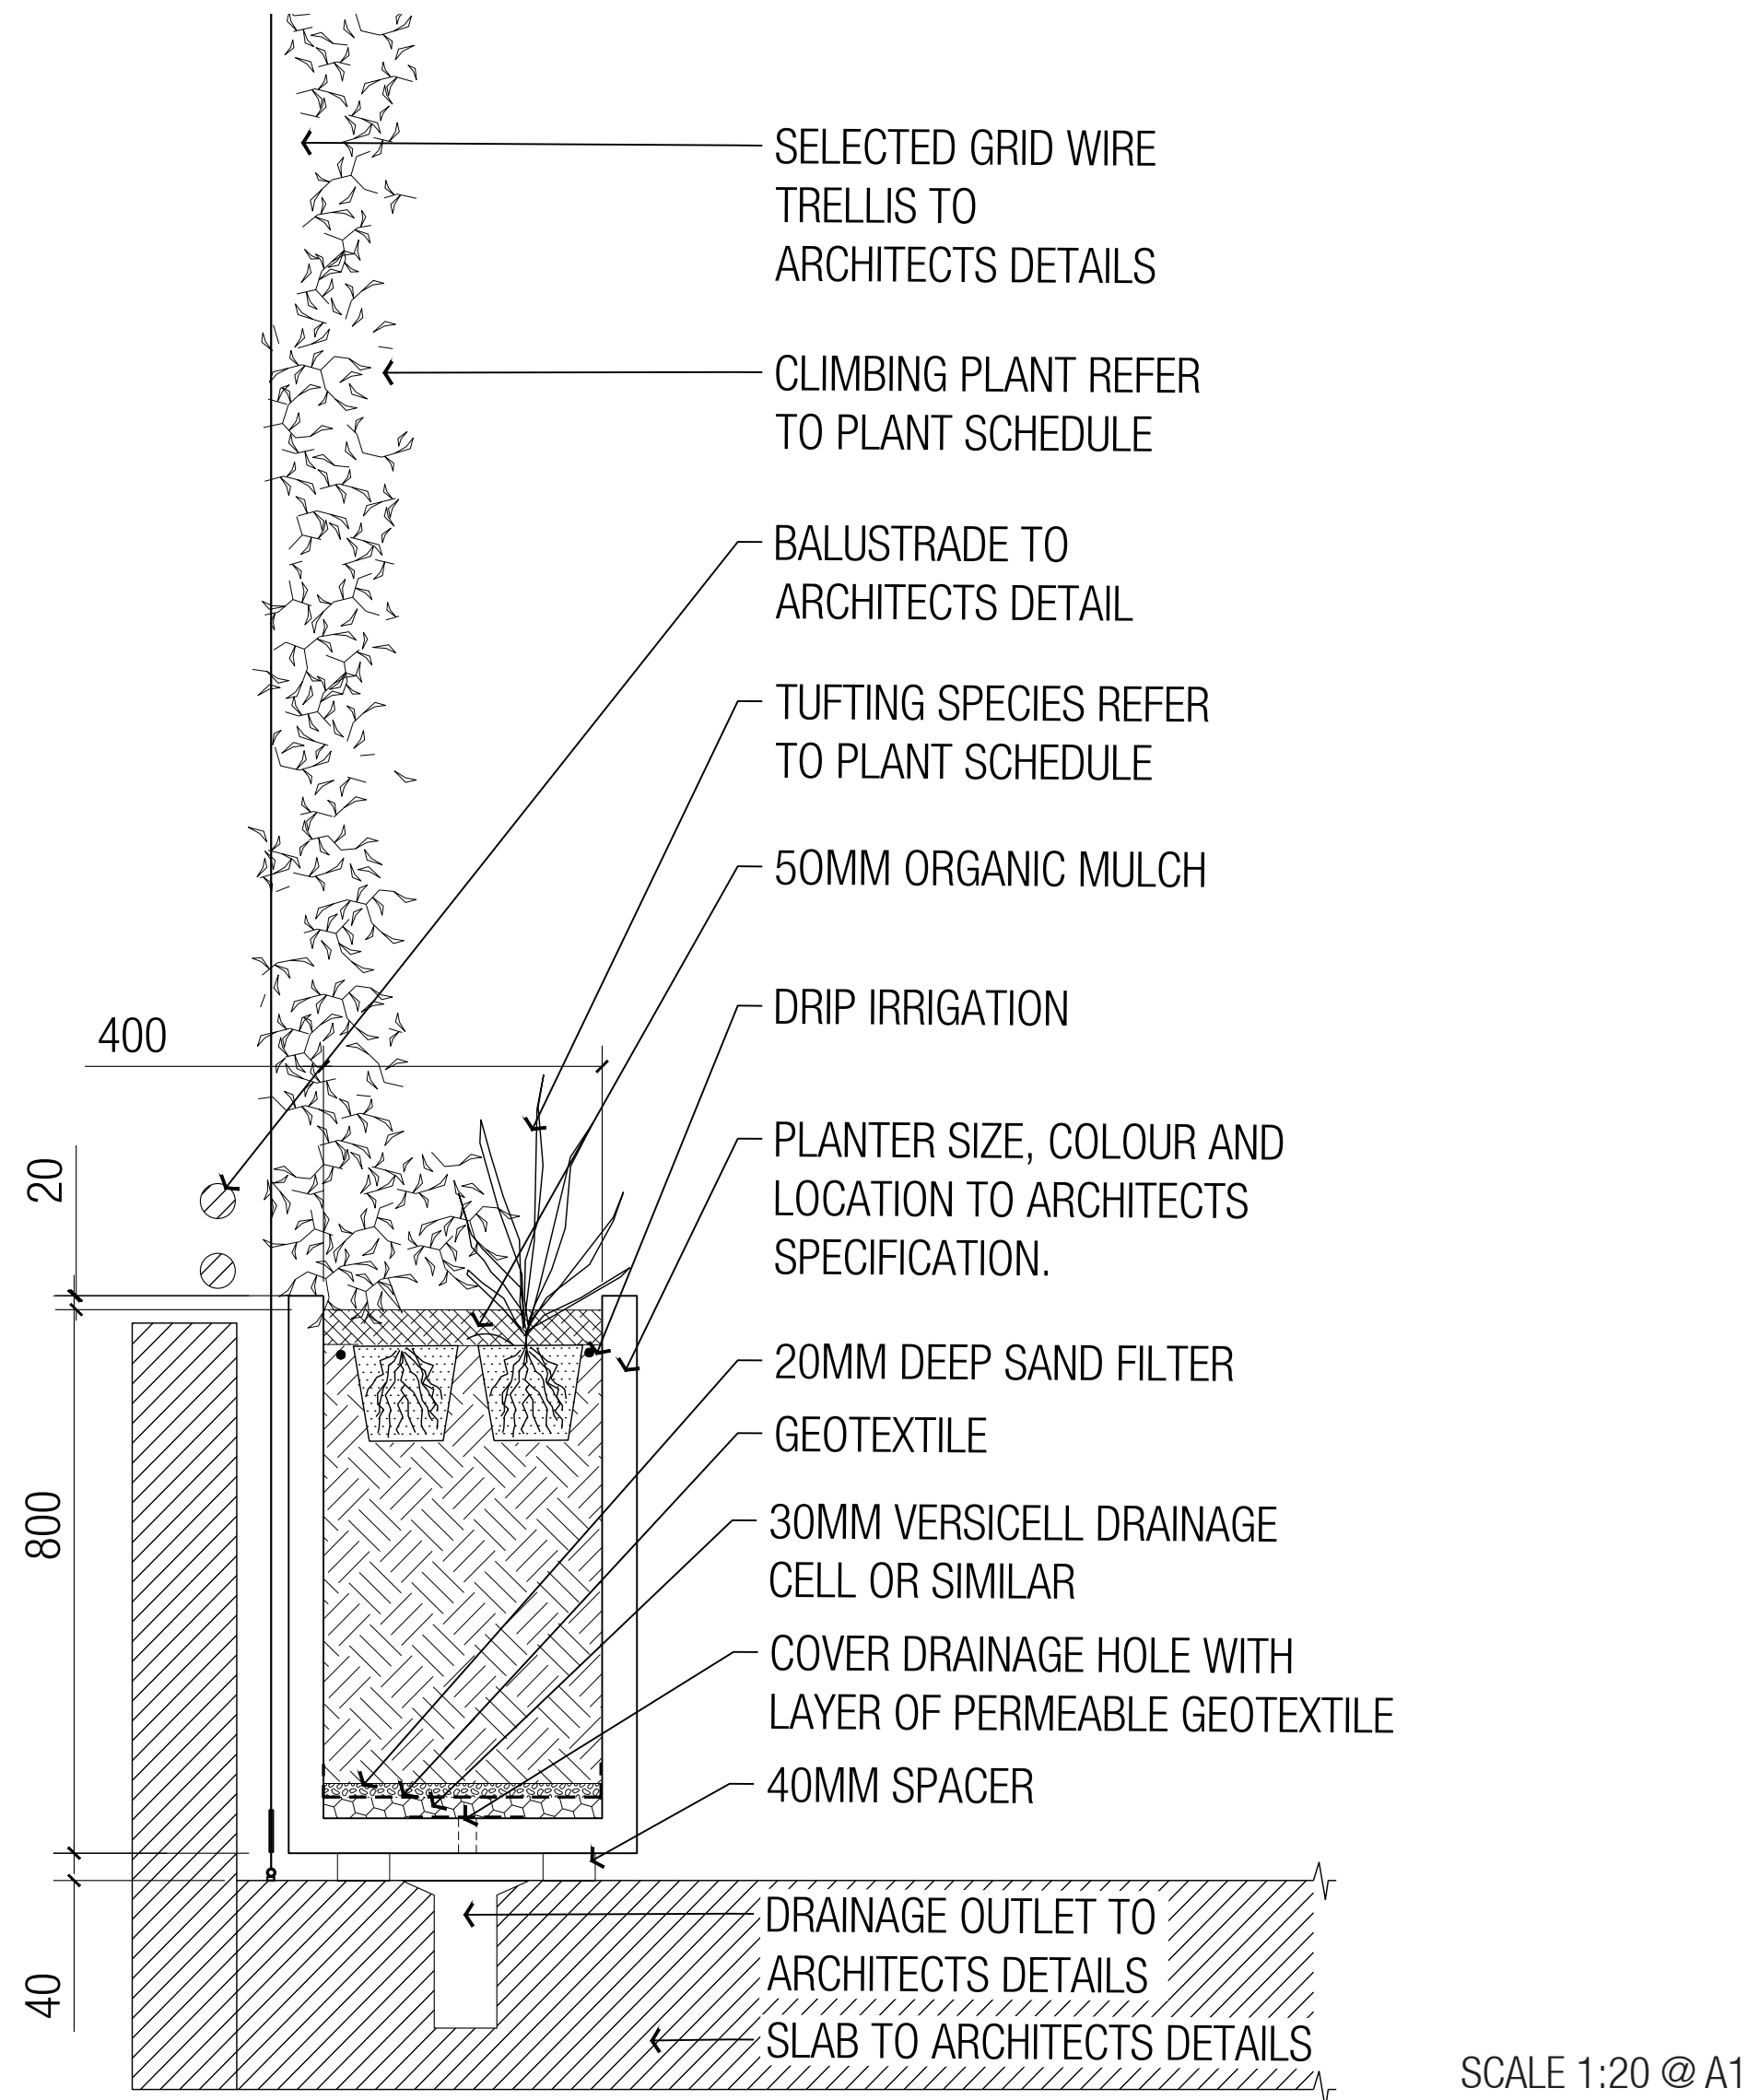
LEVEL 1 COMMUNAL OPEN SPACE RAISED PLANTER - TYPICAL DETAIL
